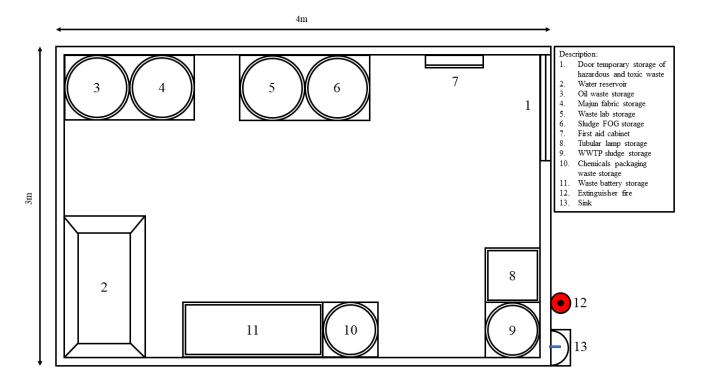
Layout recommendation temporary storage of hazardous and toxic waste in PT X
